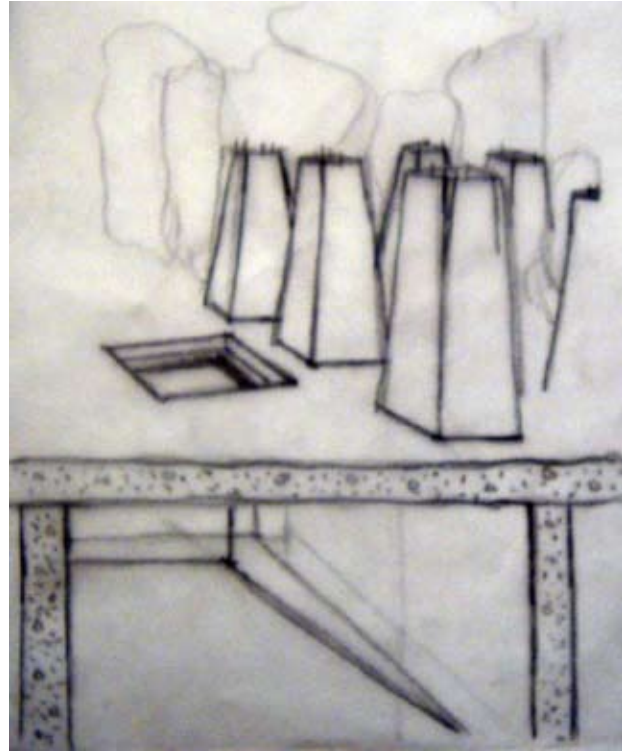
Large storage rooms are located underneath the surface platform. [March 2009]
